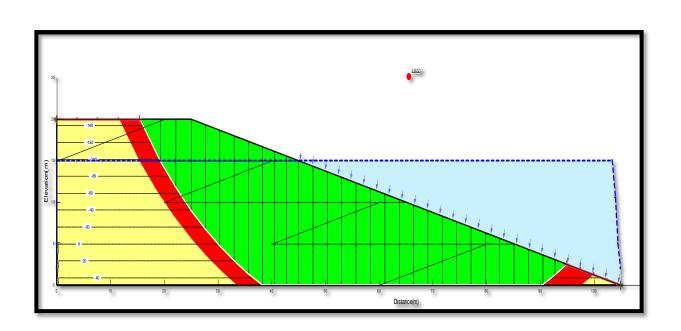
Embankment cross section for 1:4 slope at 10 m water level
